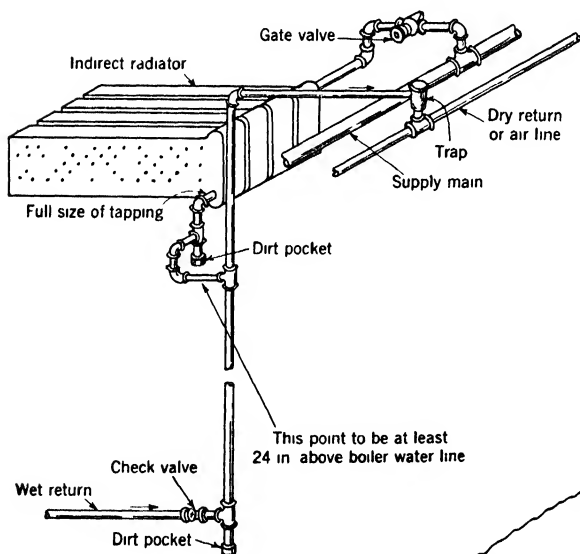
TYPICAL PIPING CONNECTIONS TO CONCEALED HEATING UNITS WITH WET RETURNS
